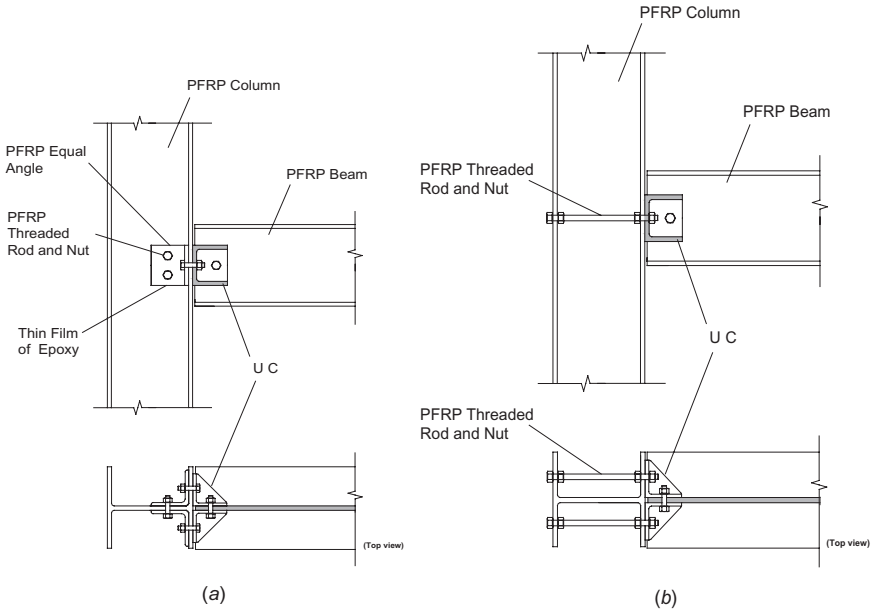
Hinged (shear) PFRP beam-to-column connection details.
